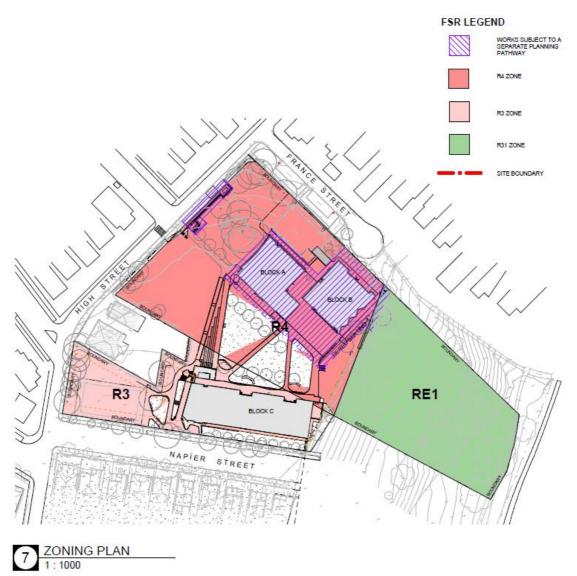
Zoning of the subject site (prepared by NBRS Architecture)
